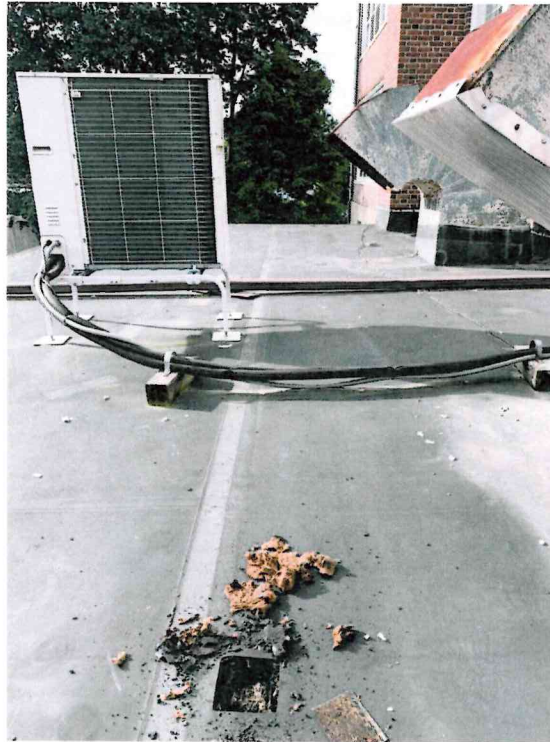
Upper (central) flat roof. Asbestos containing black tar and roof felt.
